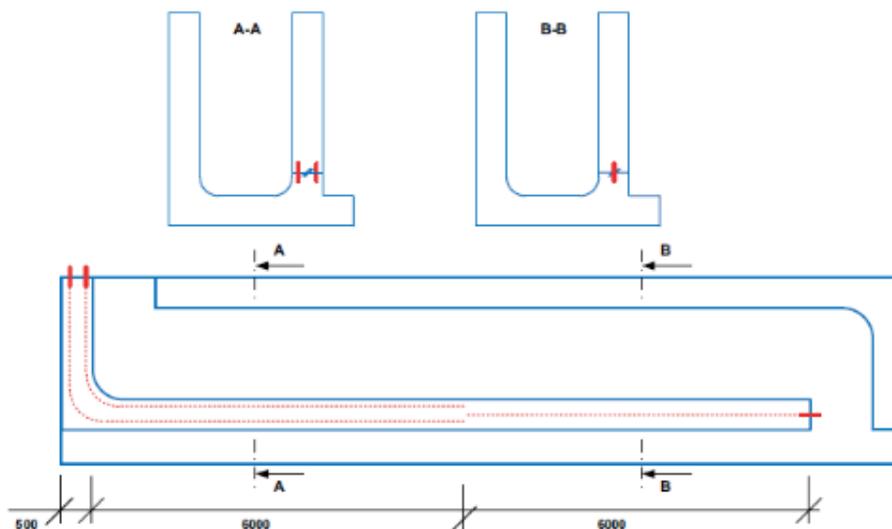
Layout of joints in the first set of trials (SKB TR-18-12).
